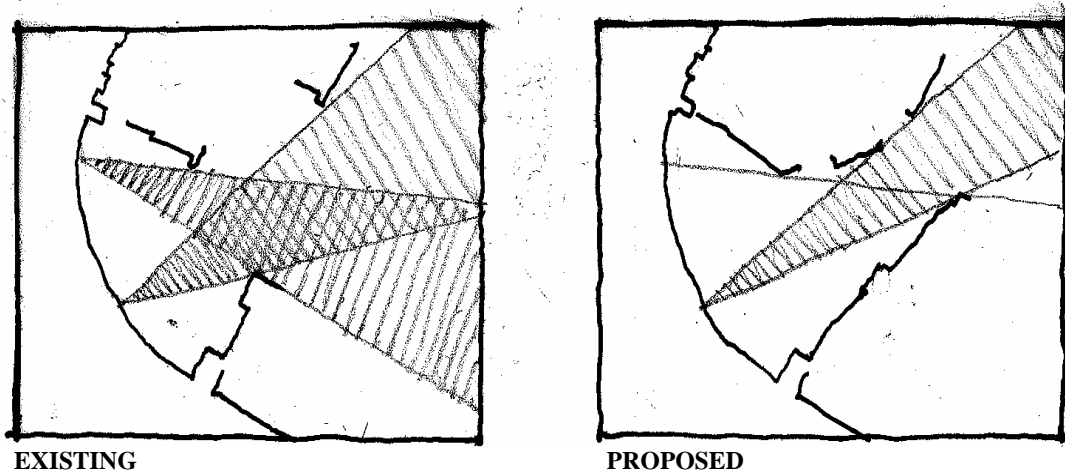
Showing existing and proposed view cones from Rose Bay Park Beach
